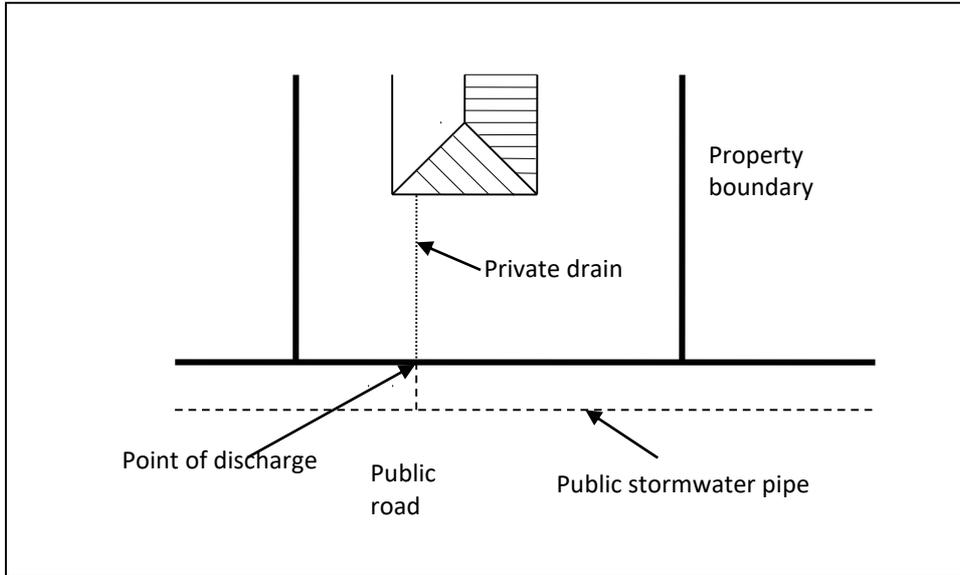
Point of Discharge Location - With Street Frontage To Public Stormwater Pipe
